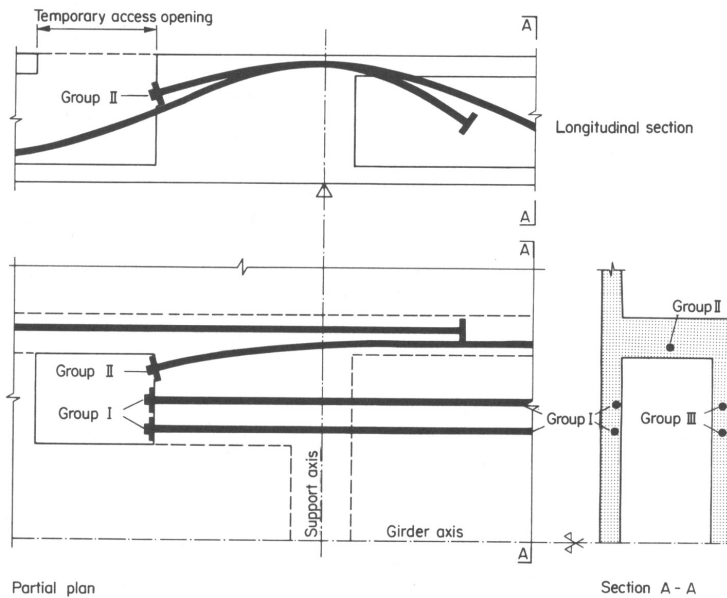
Prestressing Tendon Details<sup>25</sup>
